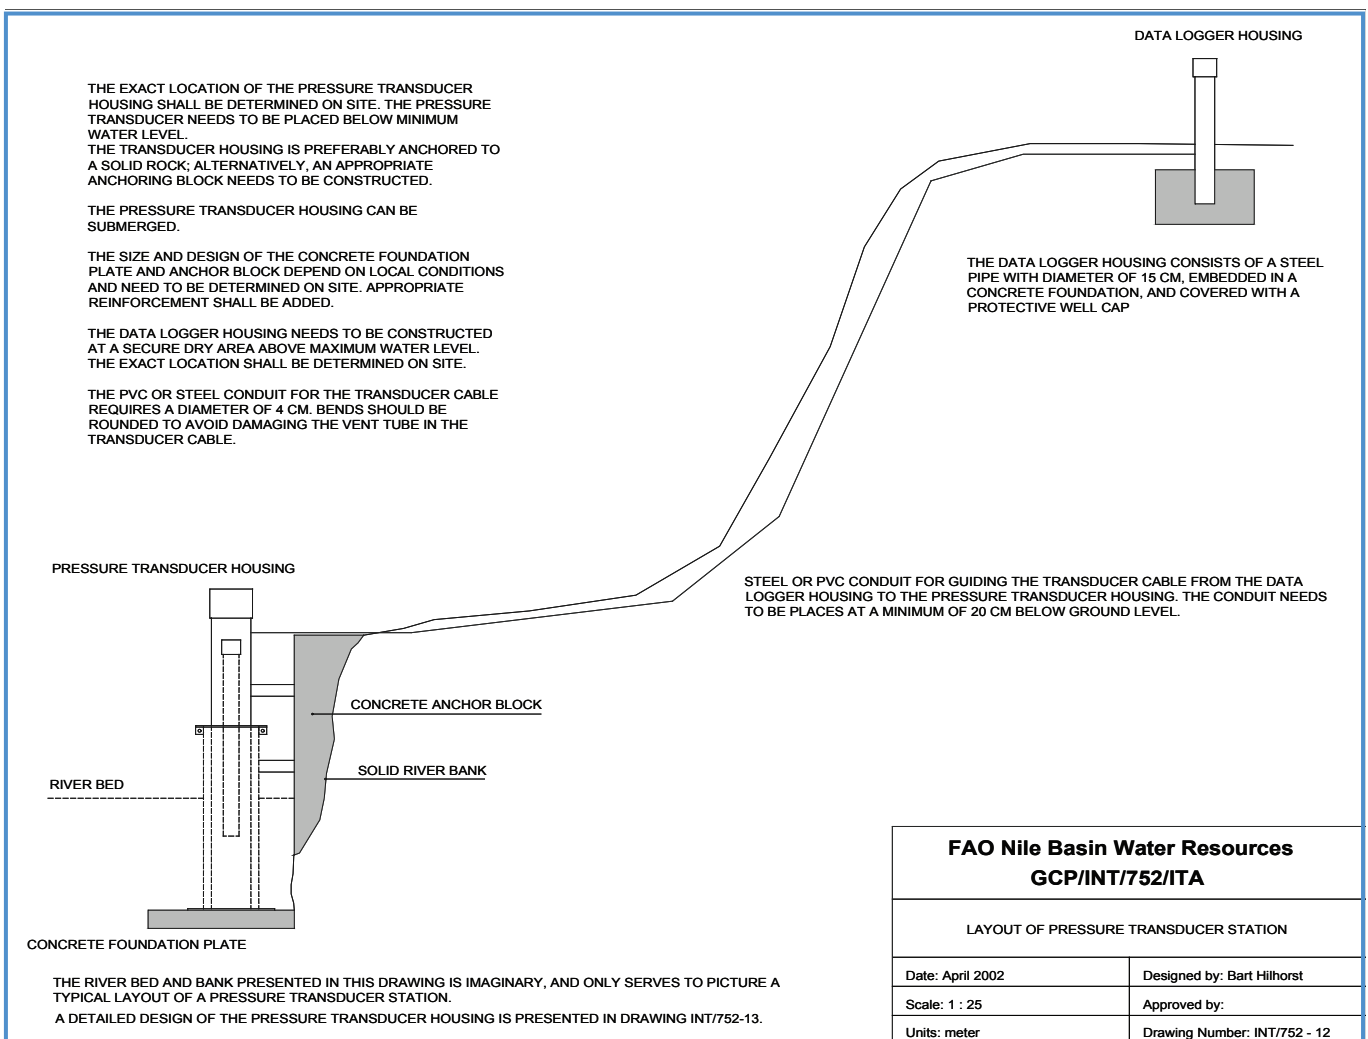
Onsite plan for installation of the Aquanaut automatic water level recorder
